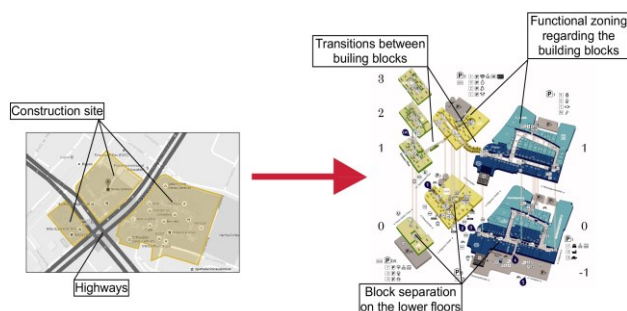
"Donauzentrum" mall. Master plan [5] and floor scheme [4]
